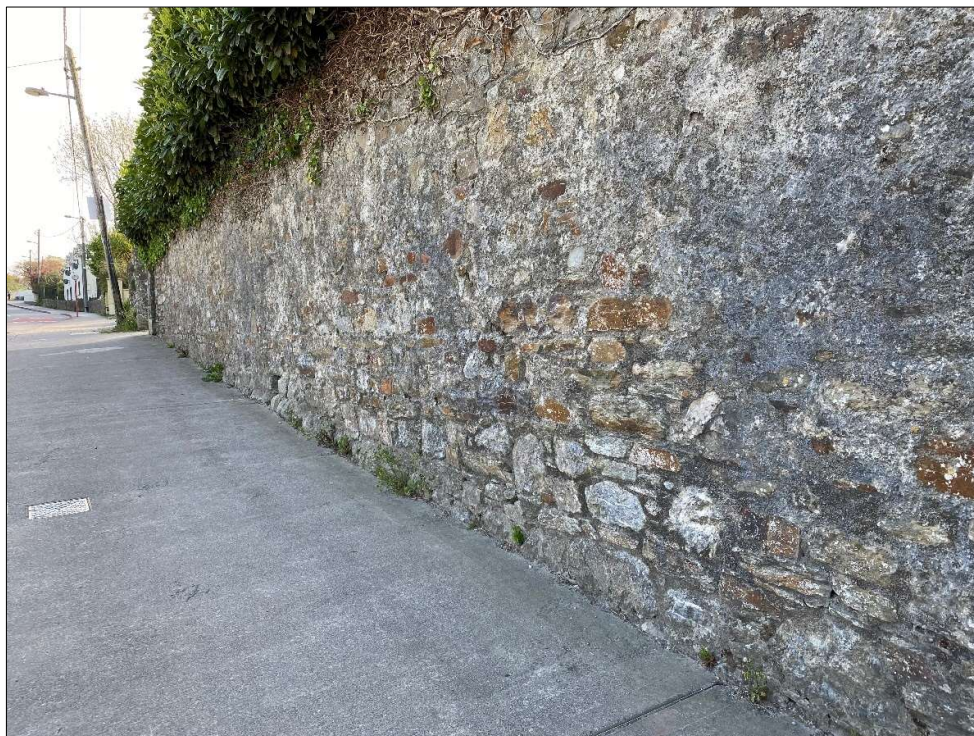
Substantial random rubble wall (CHS 5) on the western side of Church Hill behind which once stood the Church of St John the Baptist
